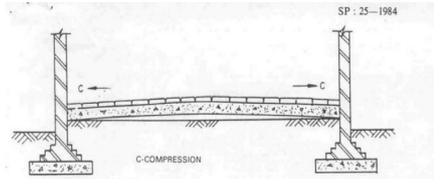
Cracking and Upheaving of a Tile Floor Due to Sulphate Action in Base Concrete
